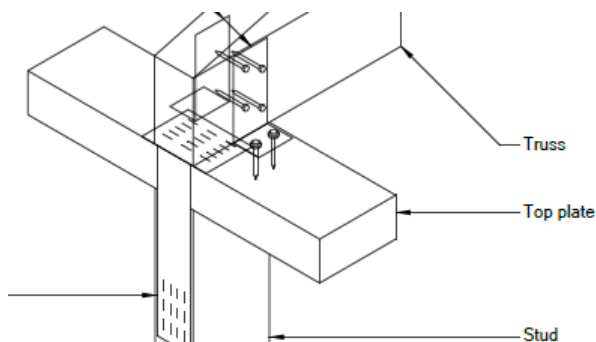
Truss fixing to top plate (used with permission from Versatile Homes and Buildings)
